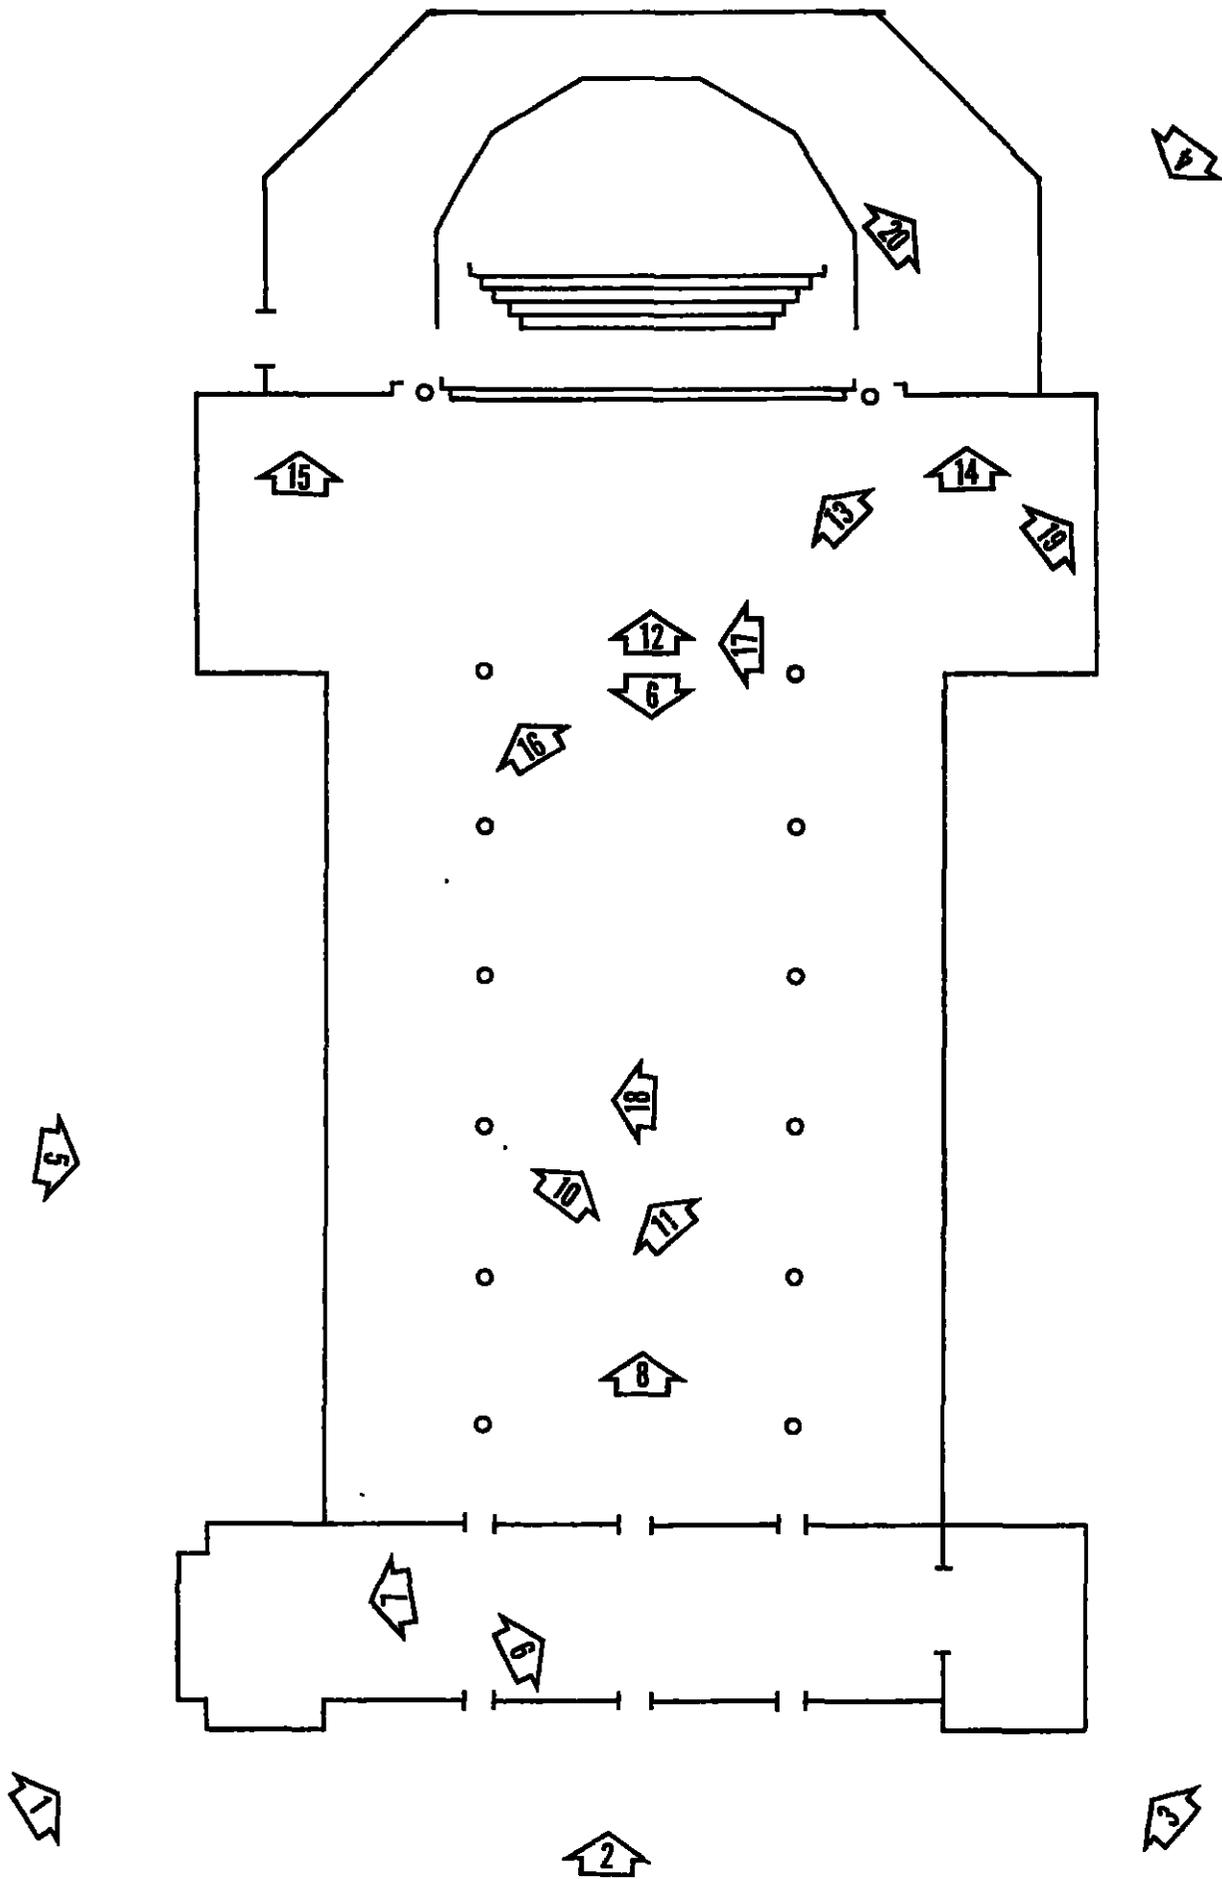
St. Anthony of Padua Church, Jersey City, NJ. Schematic Floor Plan. Photo Locator Map.
